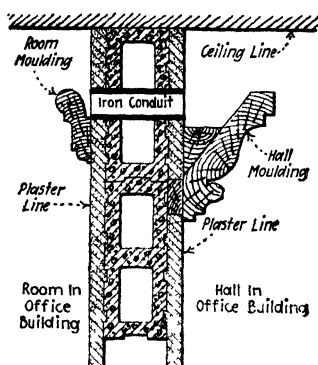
Conduit connection between wooden mouldings in hall and in rooms of an office building.
